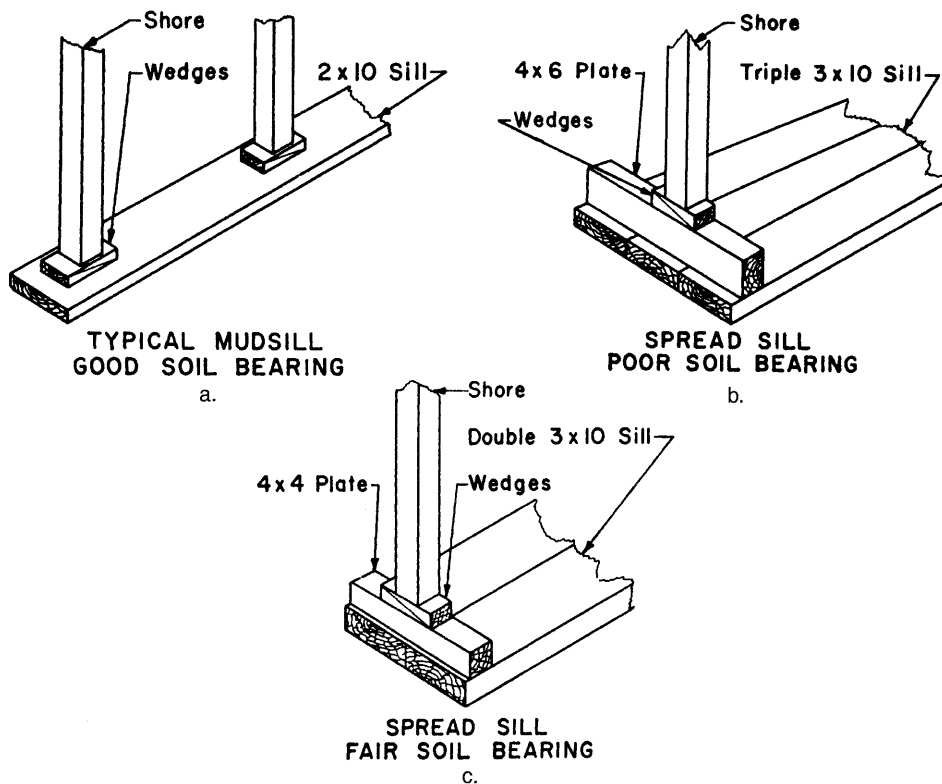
Mudsills. (Courtesy of American Concrete Institute)
